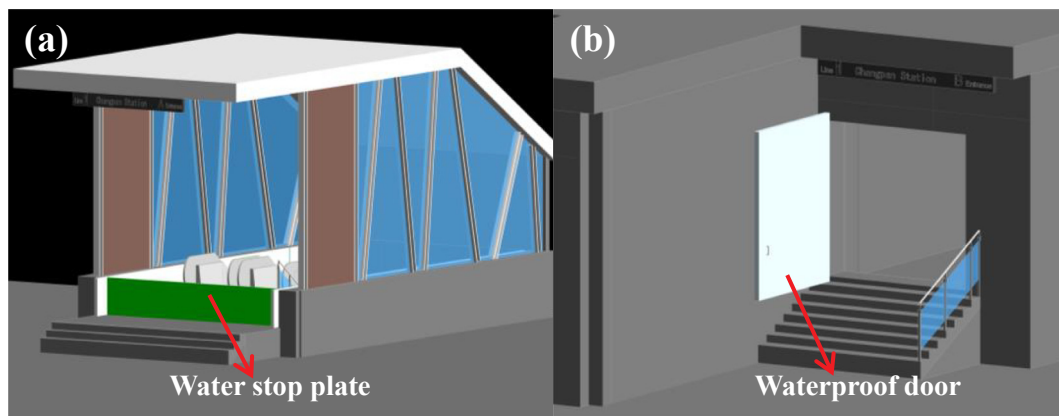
Countermeasures for metro entrance protection from floodwater: (a) water stop plate and (b) waterproof door.
